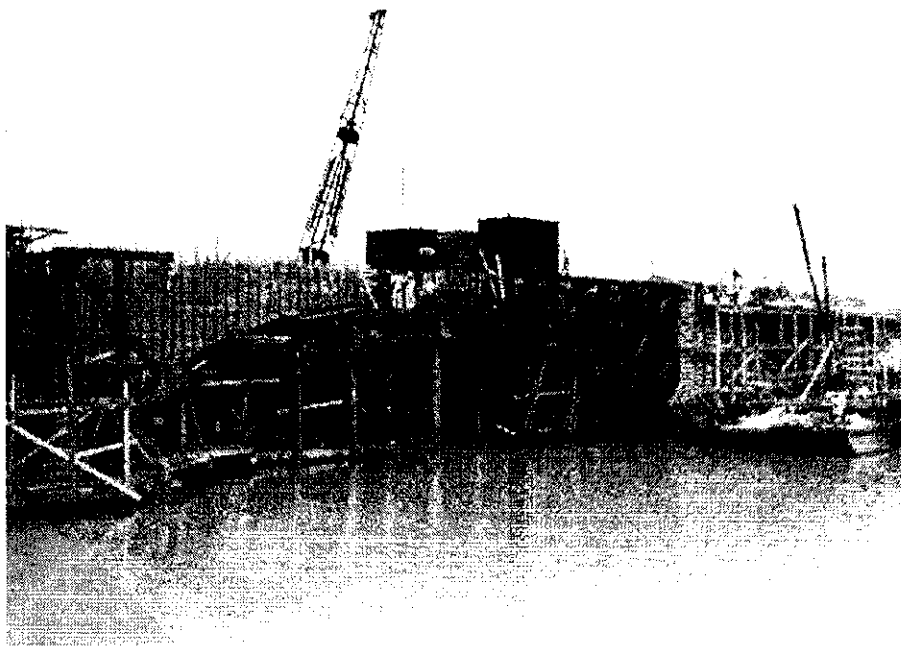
B Boundary Channel Bridge under construction: note steel trusses later covered with stone (Mount Vernon Memorial Highway File #31-991, RG-30-N, NARA)
